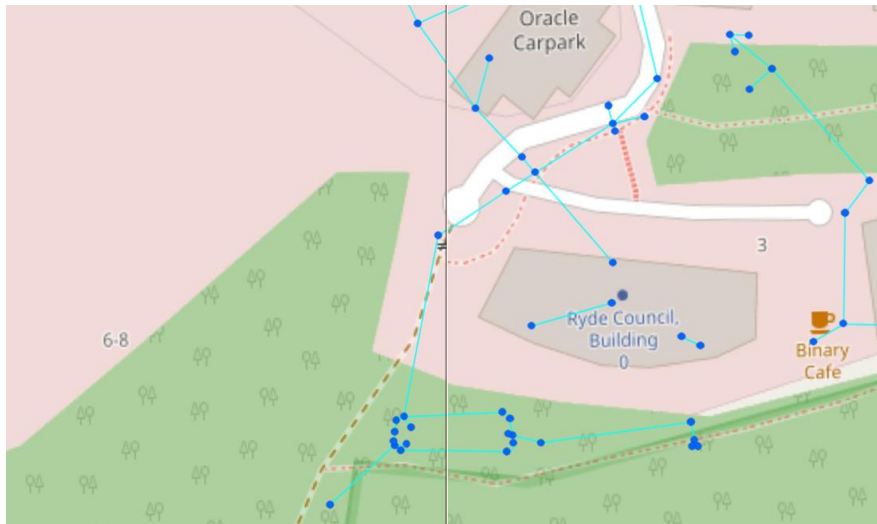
Existing Drainage Infrastructure Plans- SW Corner (Source: CoR Council drawings, BYDA)
